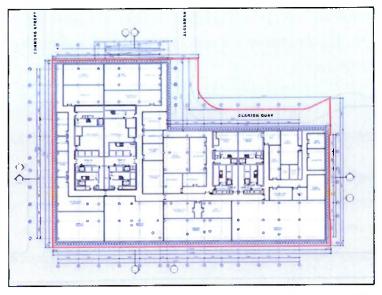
Proposed -2 Basement Plan [FFL = -9.575]
